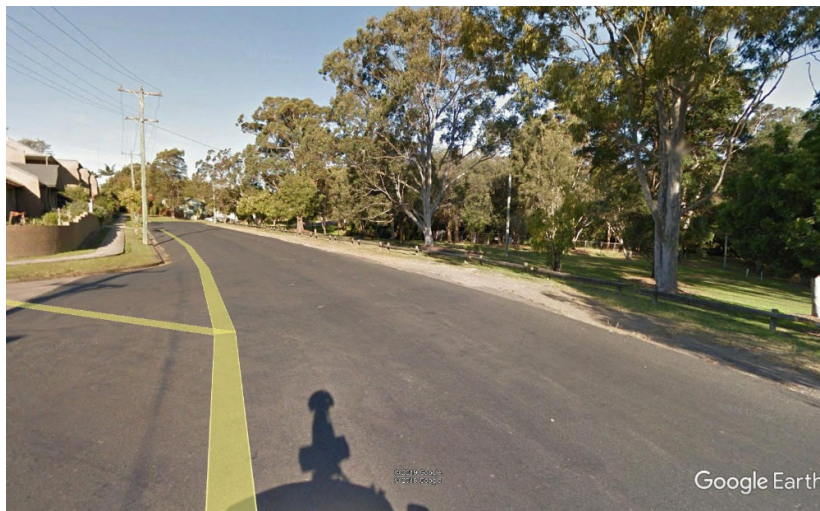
existing road shoulder and footway- west of Robinson Avenue.
